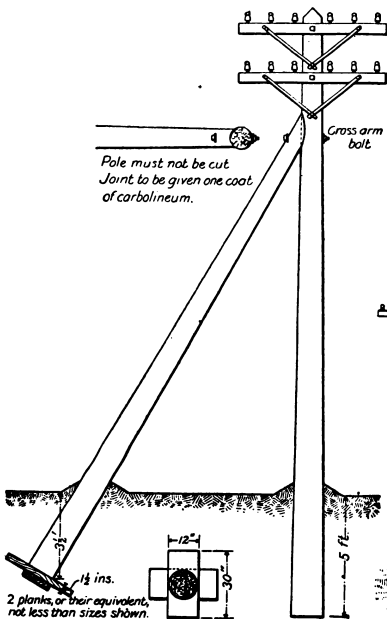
AERIAL LINE CONSTRUCTION, POLE BRACE.
